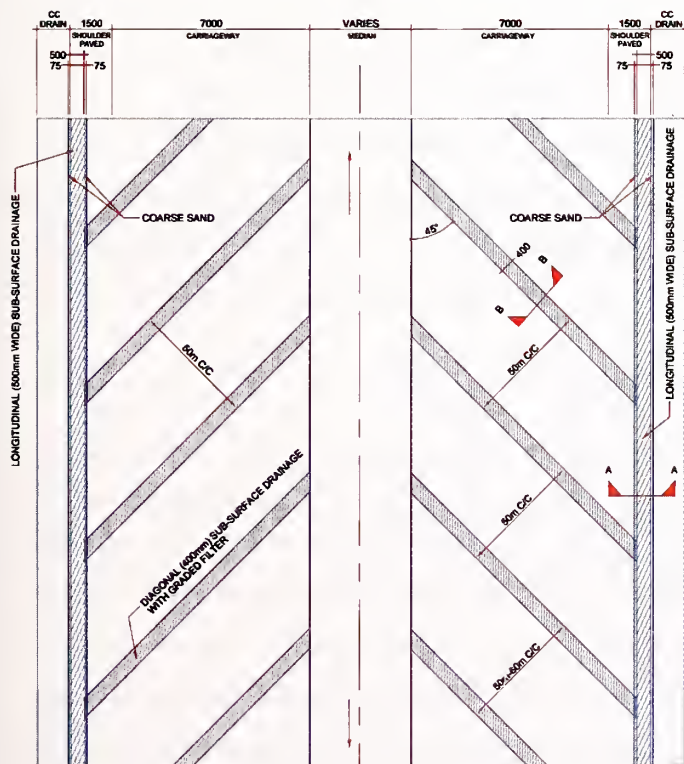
Layout Plan of Longitudinal & Diagonal Subsurface Drains
